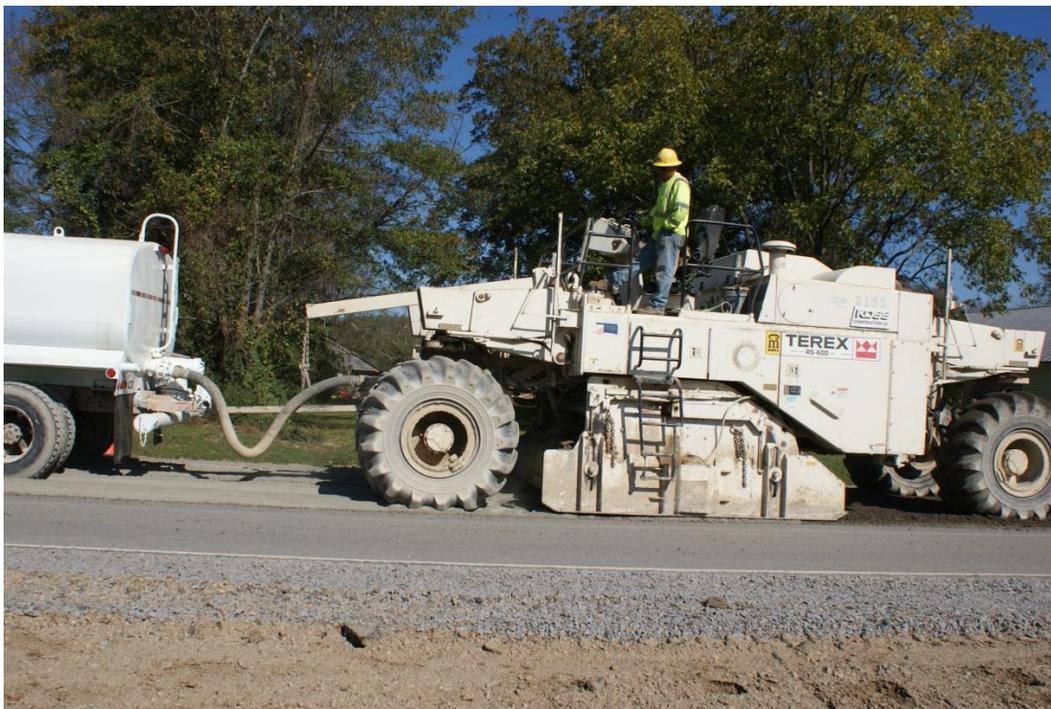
Photo. Side view of water truck coupled to reclamation unit.
